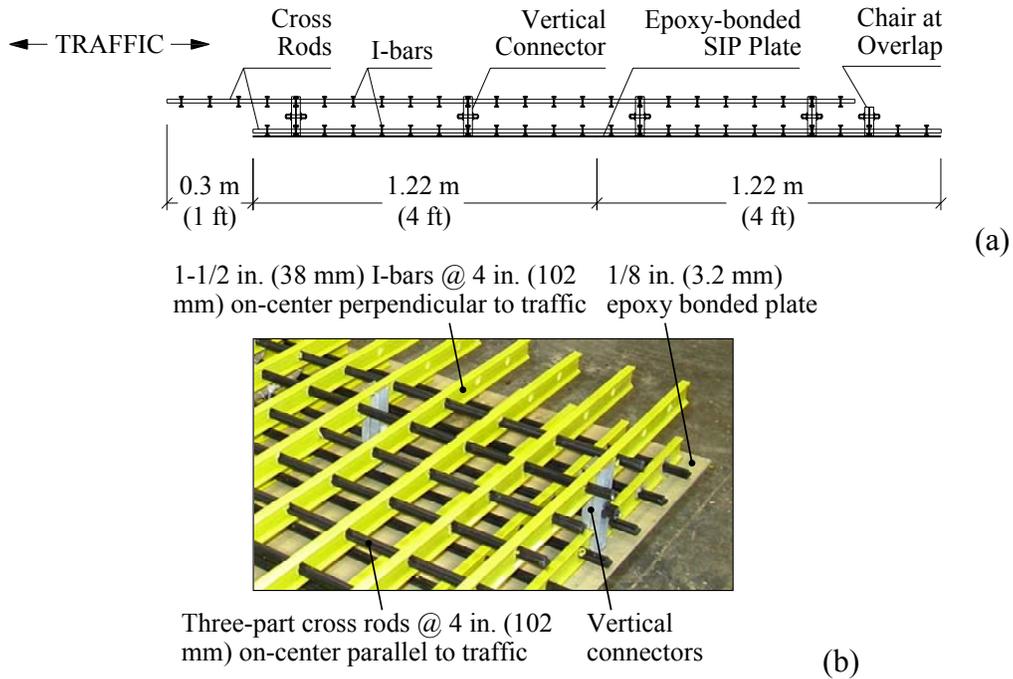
GridForm reinforcement panels: longitudinal section (a) and close-up (b).
